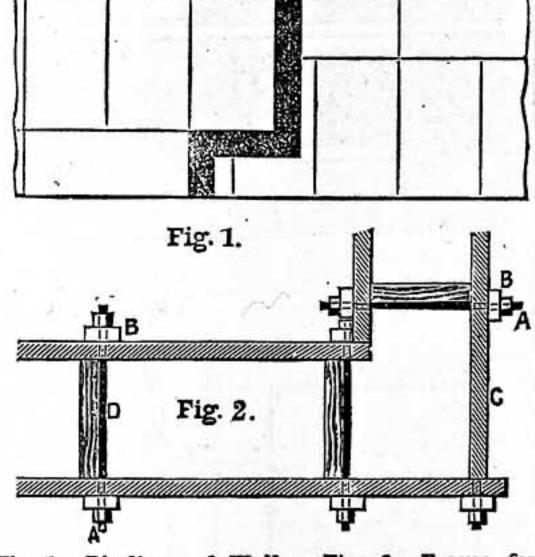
Binding of Wall. Fig. 2.—Frame for Concrete Building.
